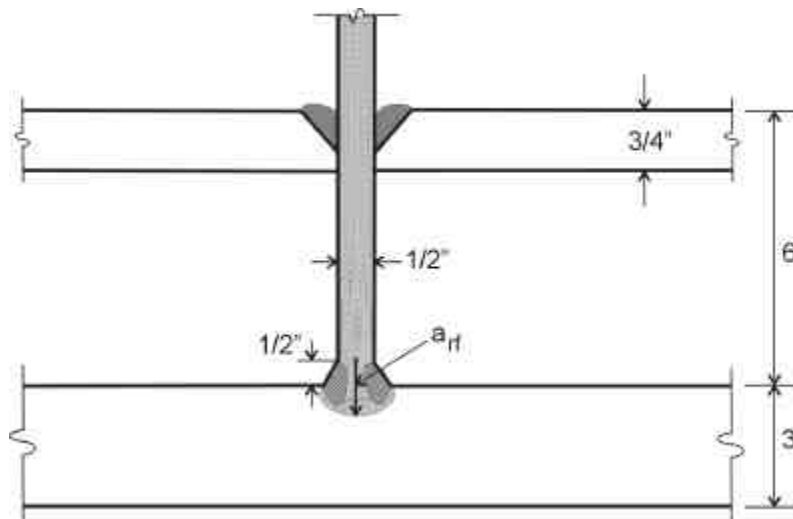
Idealized Circular 3D Crack Arrested in Web-Flange Weld Zone
